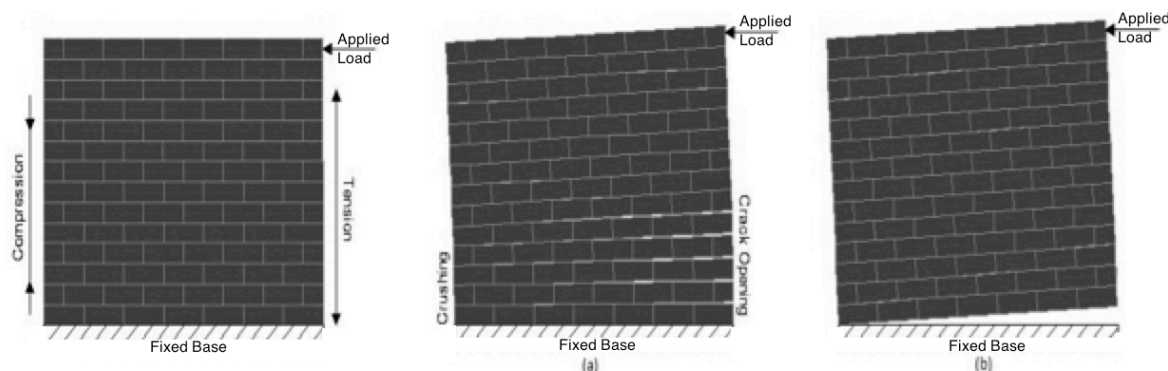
Bending failure in shear walls: (a) flexure crack opening, (b) overturning.
